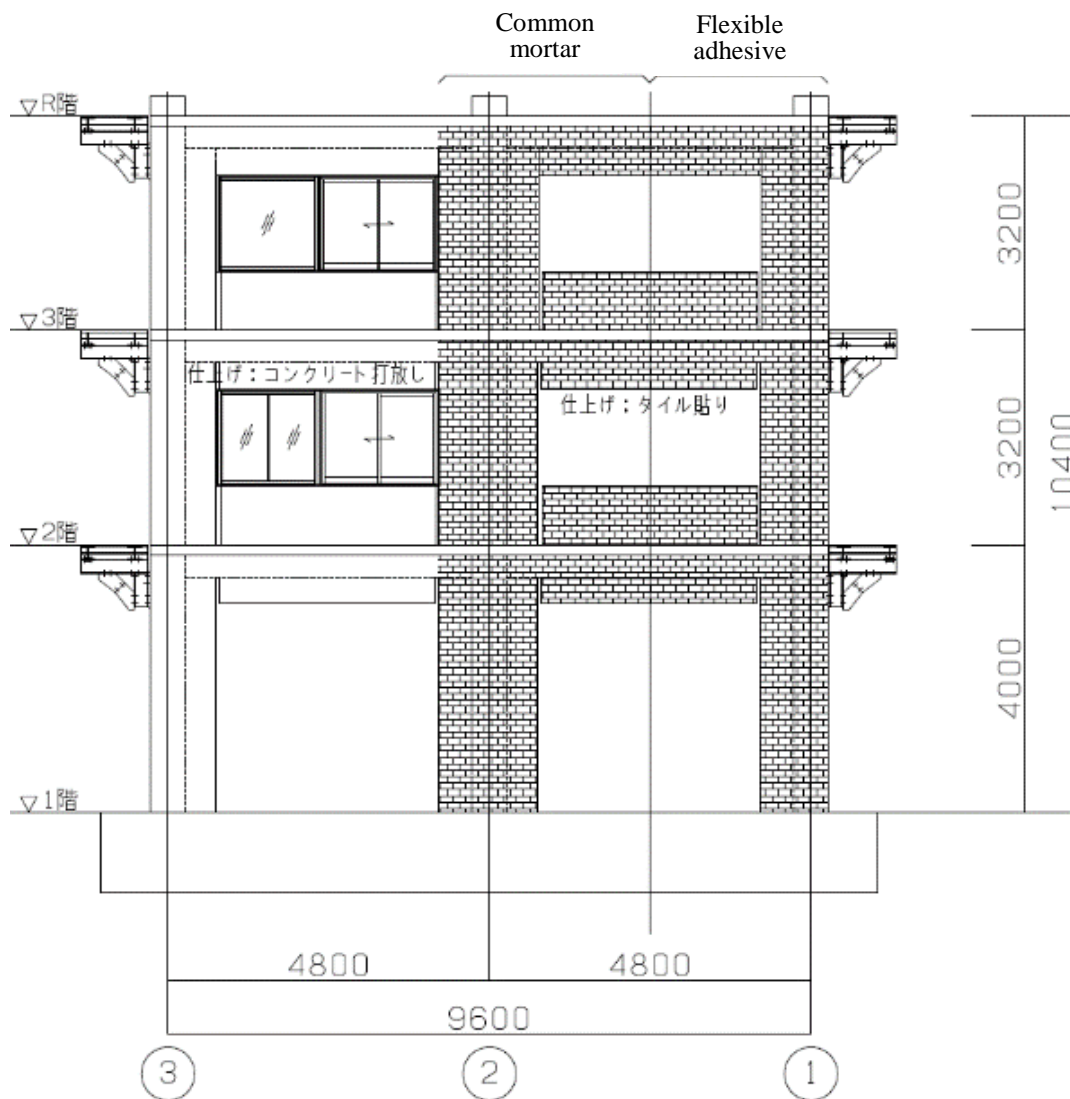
Window and tile configuration (note – tiles are only provided on one side of the building, while windows are placed on both sides but on the same bay)
